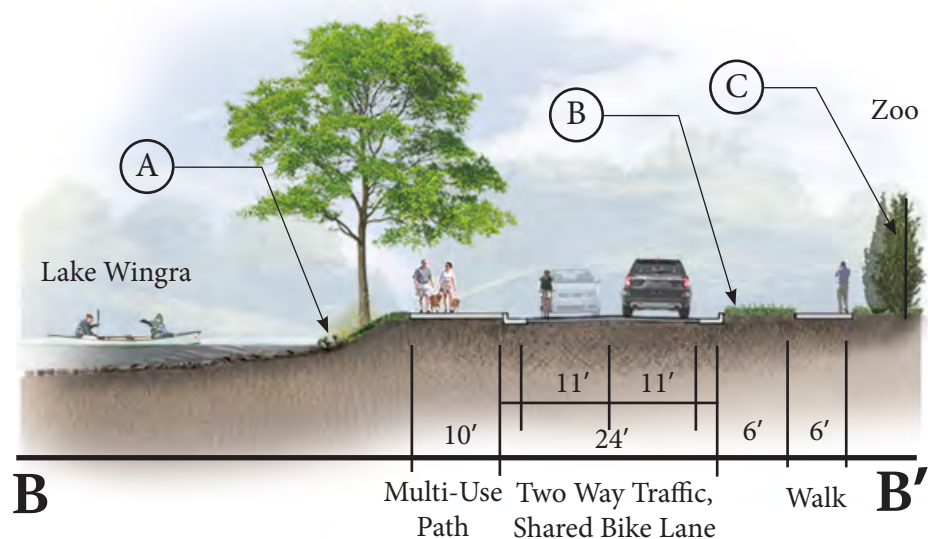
Vilas Park Drive Cross Section B-B' at the Zoo in Concept B
